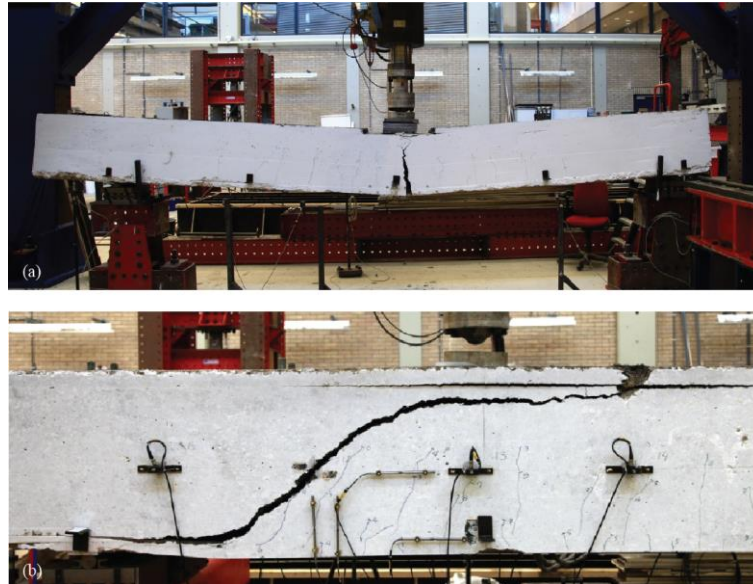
Failure modes observed in the beams sawn from the Ruytenschildt Bridge: (a) flexural failure, RSB01; (b) shear failure, RSB03A (Yang, 2015).
